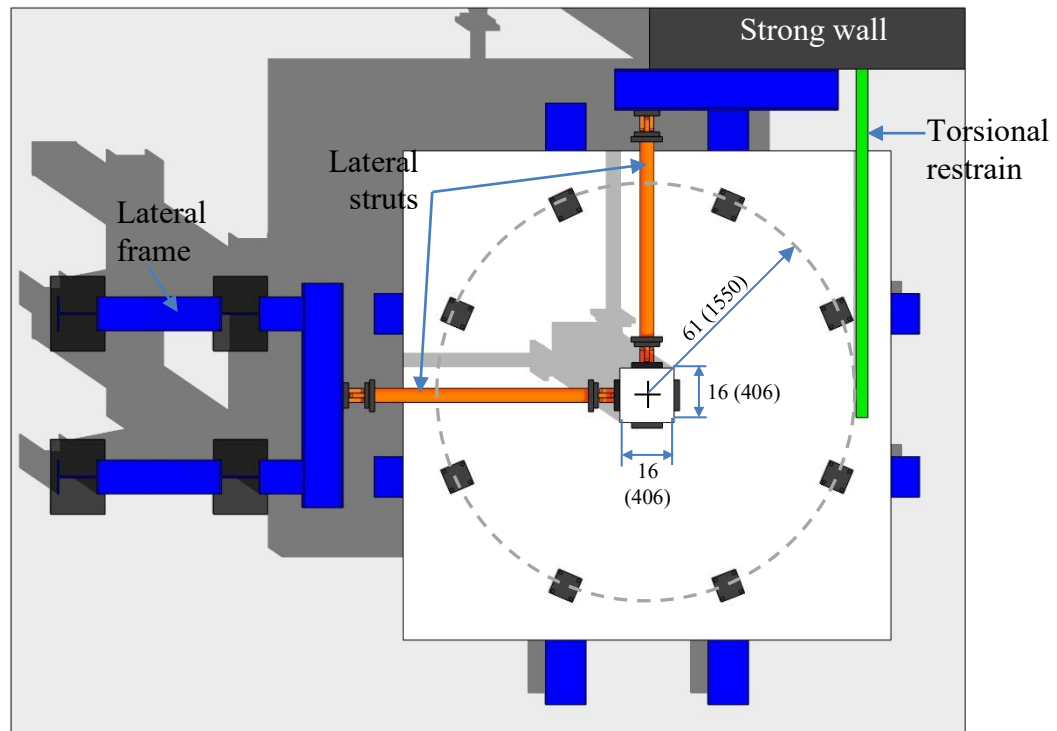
Concentrated Load Test Setup. Top view, parts and dimensions [in (mm)].
